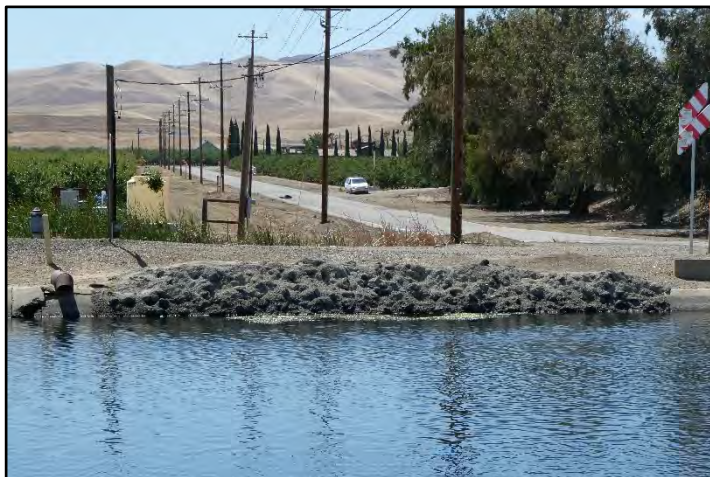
Repairs to the right bank canal lining around M.P. 42.53; camera facing right bank from left bank, May 12, 2022 (B00426).
